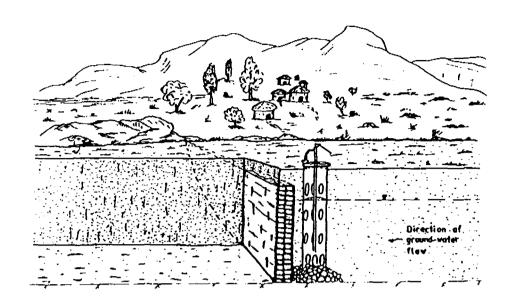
General principle of a sub-surface dam (Source: Nilsson, 1984).
